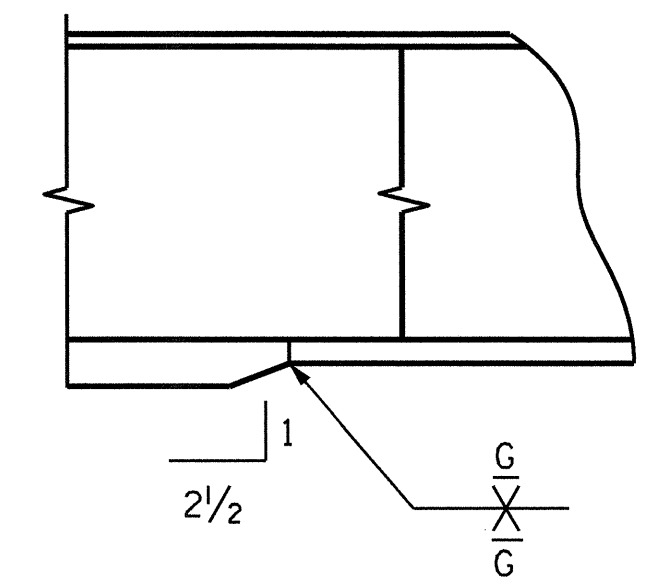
(PLATE DIMENSIONS AND DETAILS ARE SHOWN WITHOUT THE OPTIONAL B.F.S.)
